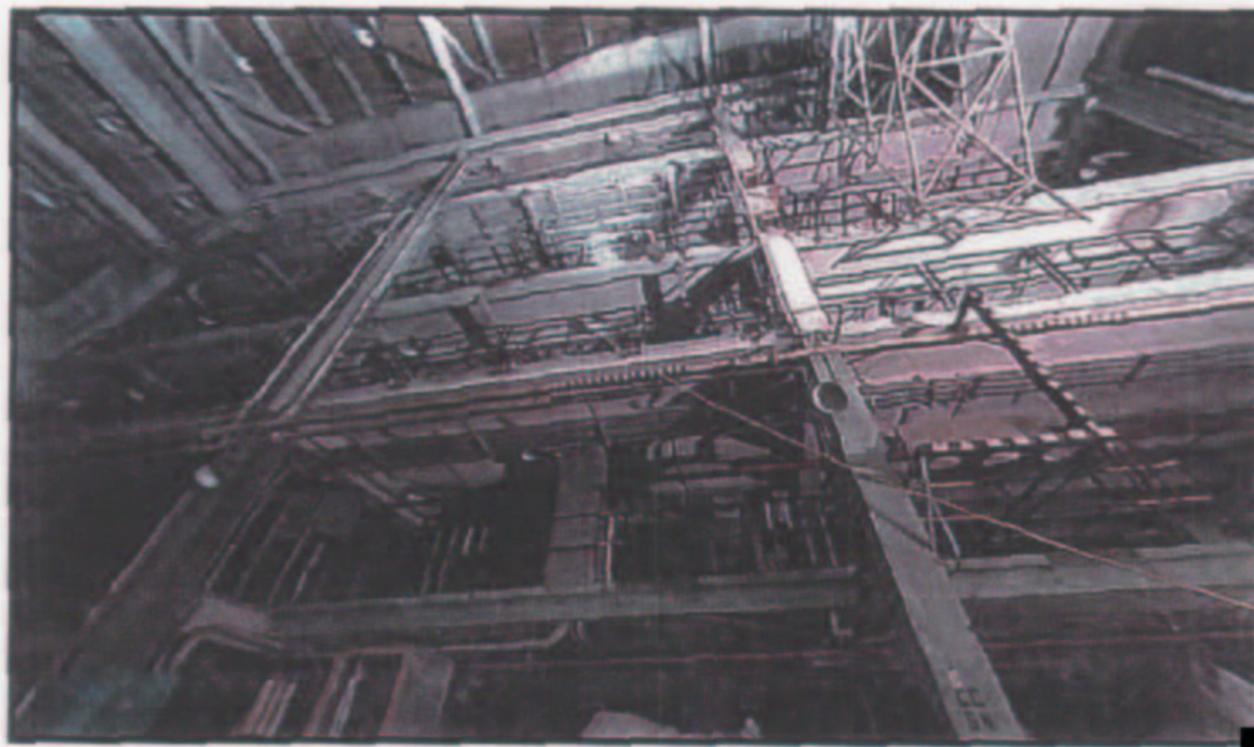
Truck Alley/Crane Bay is located on the 1st floor and provided access to all the floors within the C-420 Building except the top floor.
